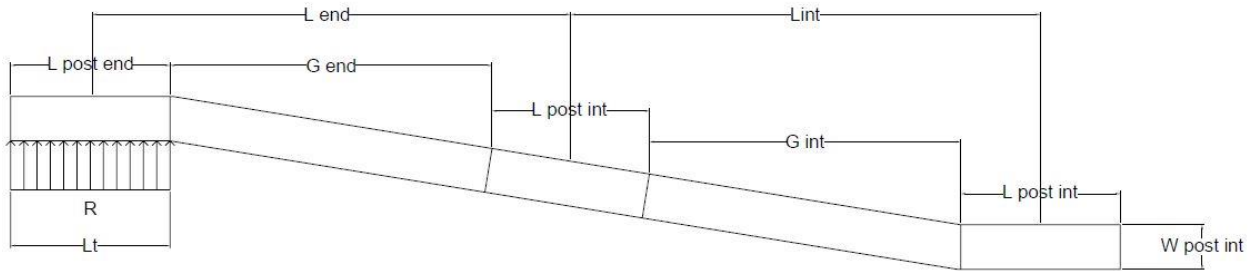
Modified AASHTO Post and Beam Method Failure Mechanism for Bridge Rail End Sections
